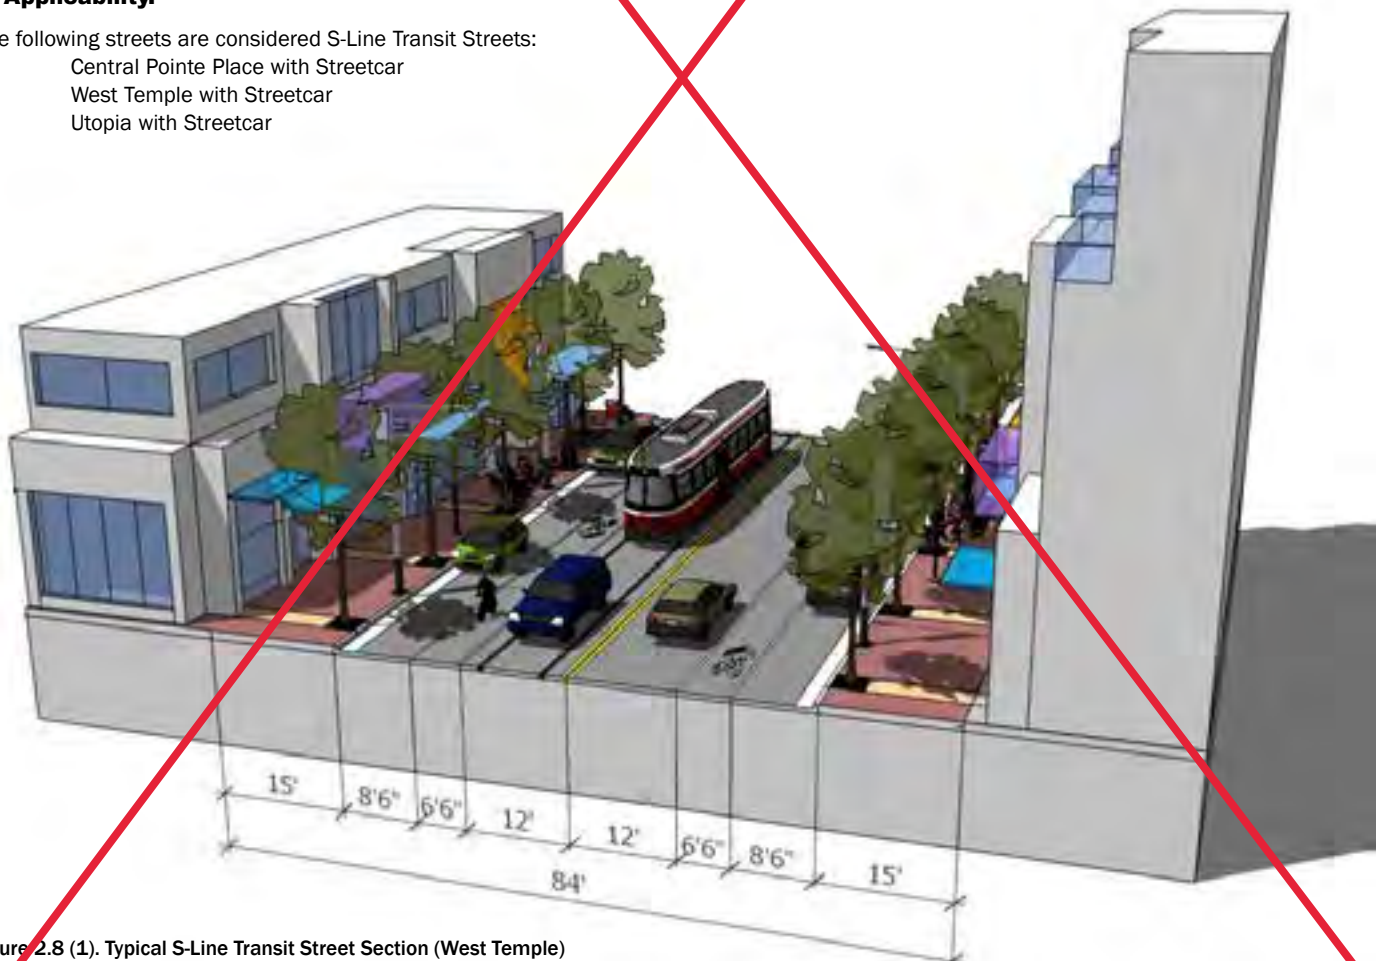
(1). Typical S-Line Transit Street Section (West Temple)
